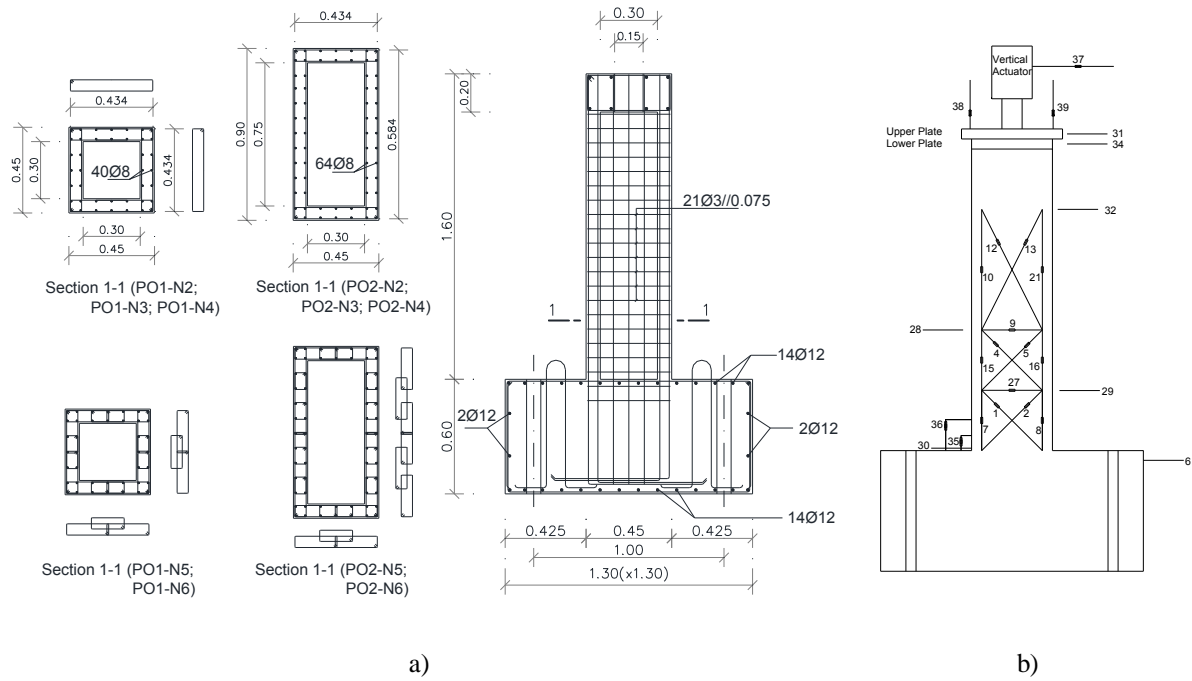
Hollow RC piers: a) geometry of specimen and b) lateral LVDT layout.
